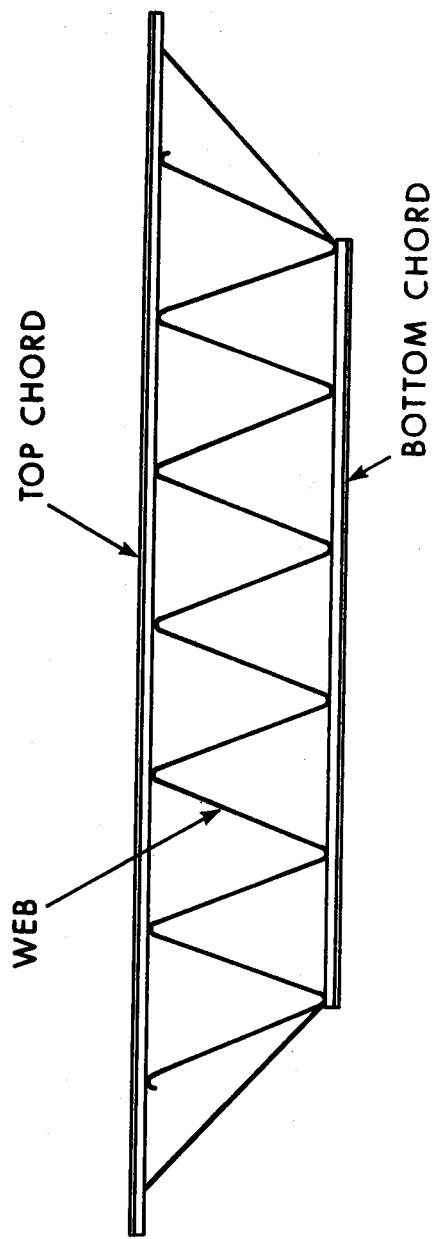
TYPICAL OPEN WEB STEEL JOIST
